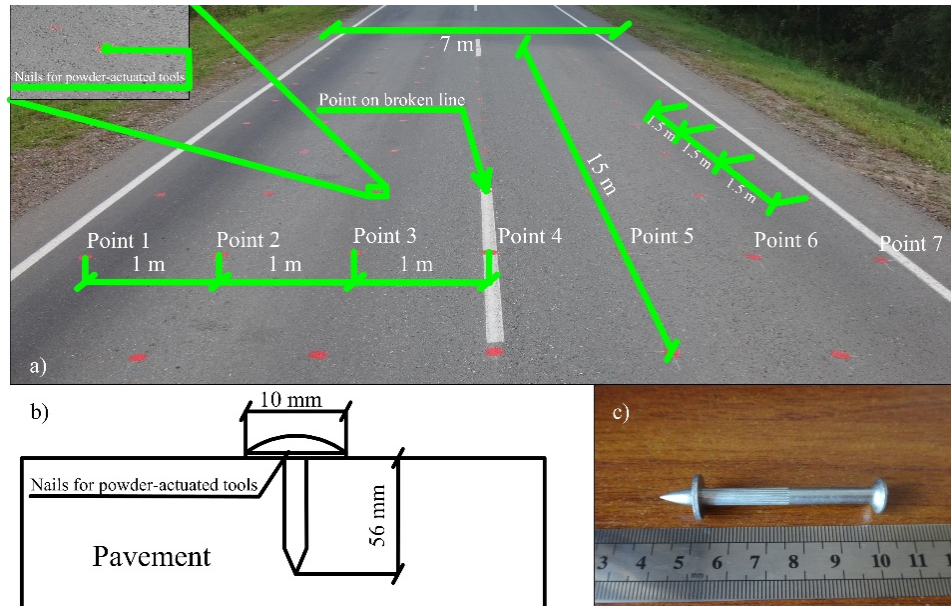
a) Scheme of points' location in the sections for monitoring of pavement surface displacement. b) Layout of the nail location in the pavement. c) Visual representation of the nail.
